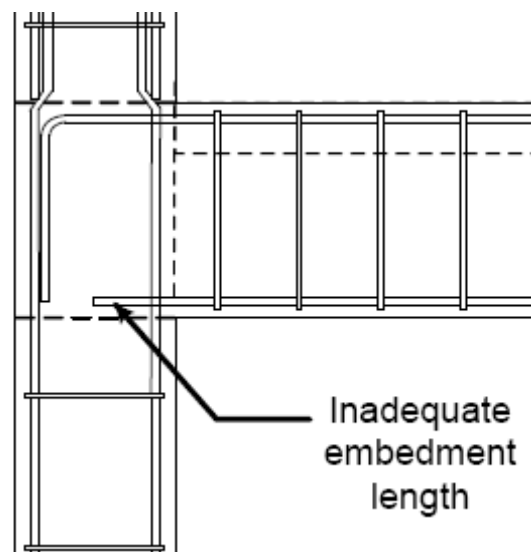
Detailing of longitudinal beam bottom reinforcements
